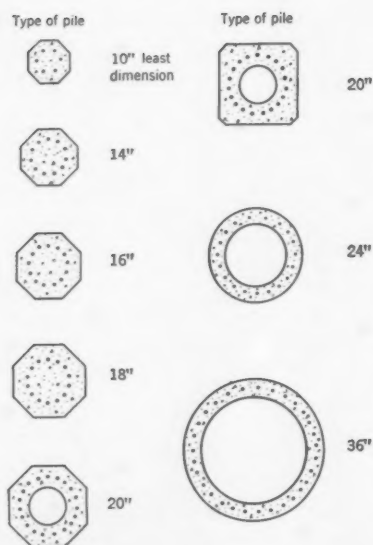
Some typical sections of pre-tensioned piles. Large piles frequently are post-tensioned.
